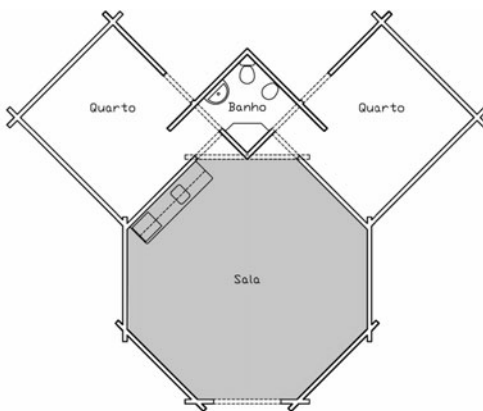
Pego Guesthouse, nicknamed "Mickey Mouse," ground floor plan (António Madureira Personal Archive)
